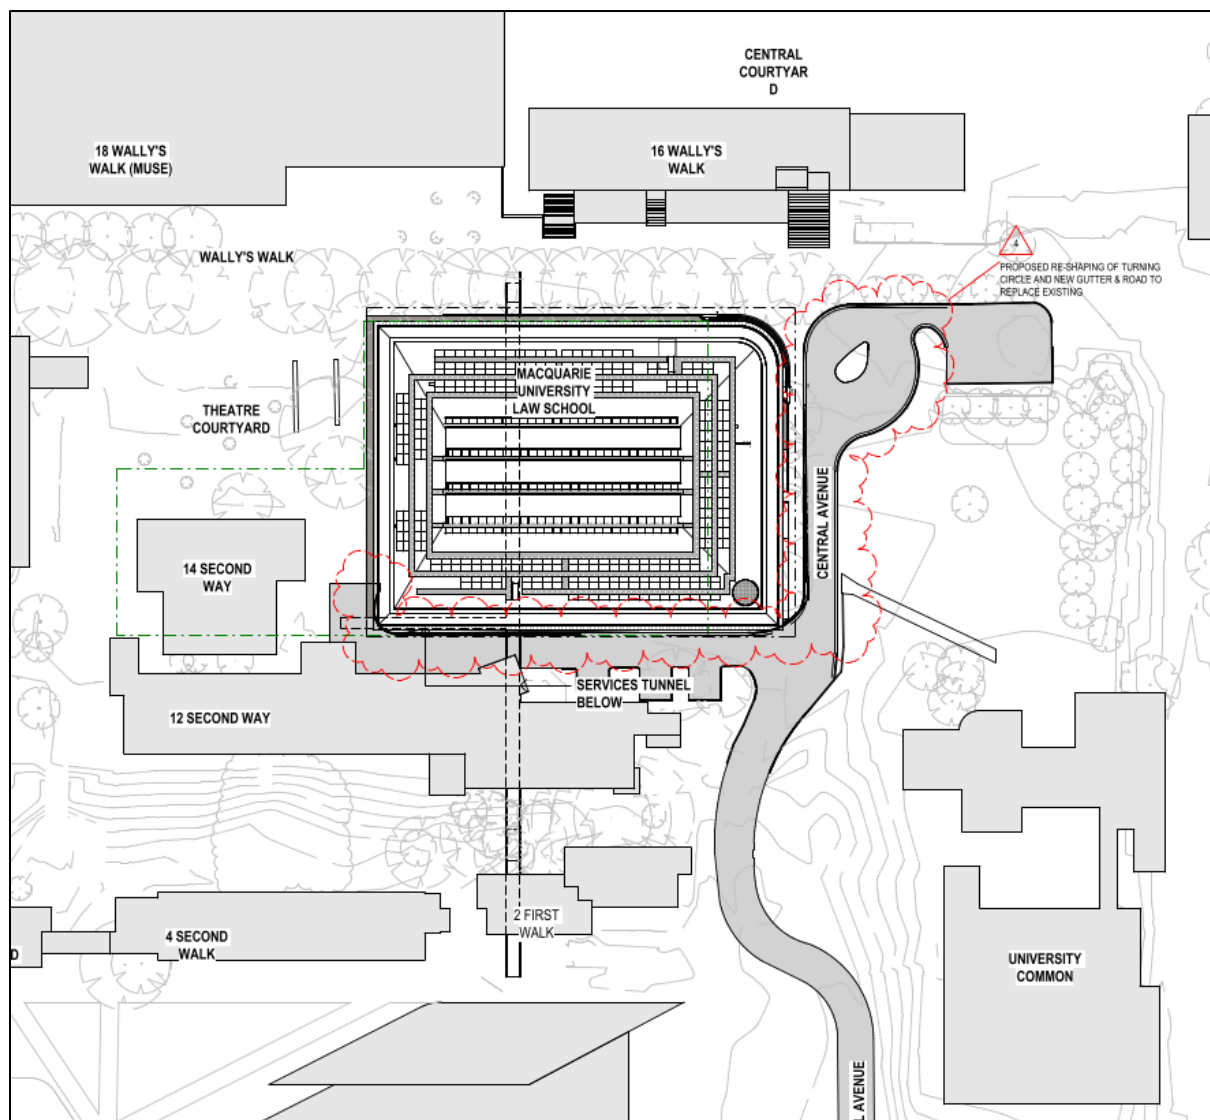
Site plan showing proposed building in relation to surrounding buildings
